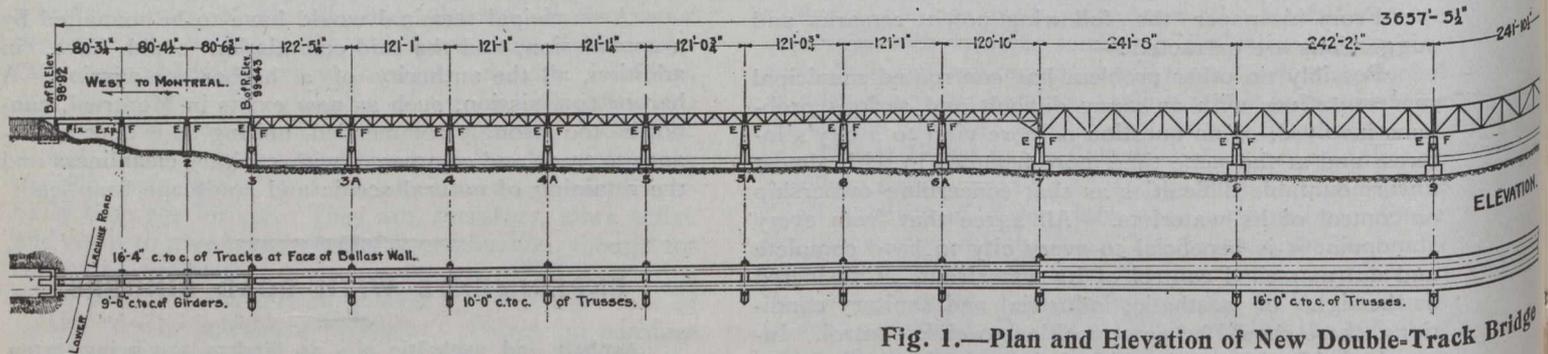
Plan and Elevation of New Double-Track Bridge
